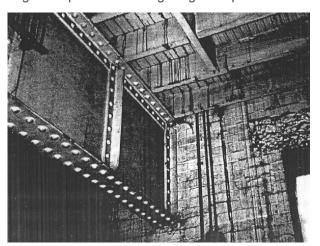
Detail of riveted steel beams, timber floor structure and brickwork, 1991
